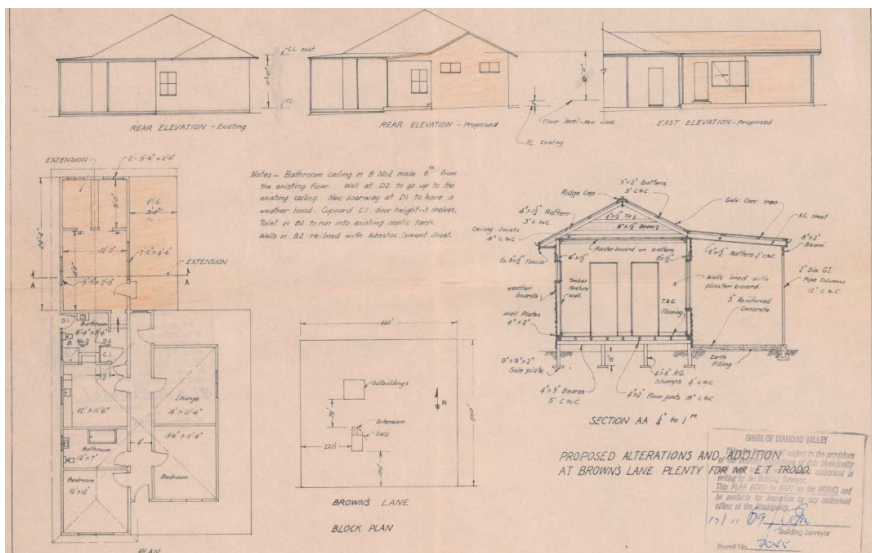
Building plan showing the 1969–70 rear extension. (Source: BP 7045)
